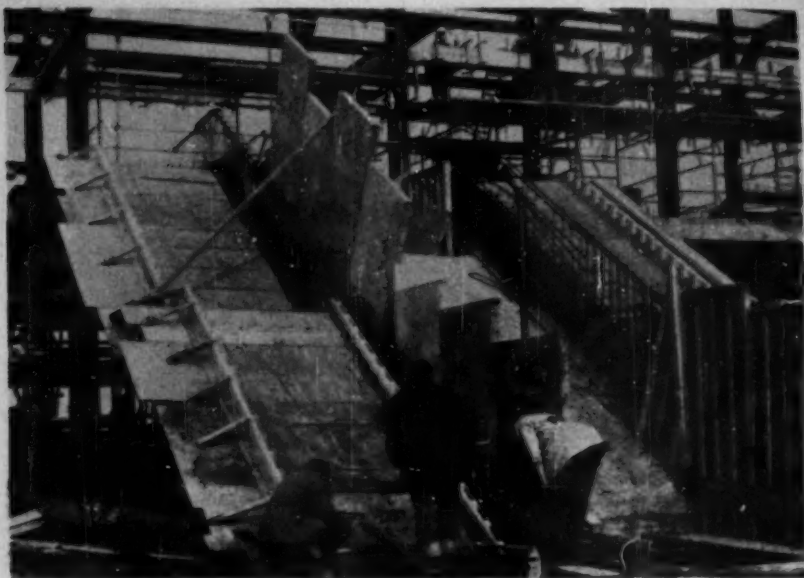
Cast-insitu Construction of Escalator Supports and Stairs.
